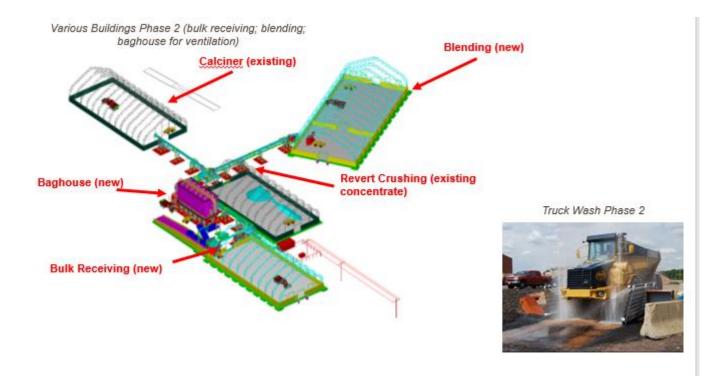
New Revert Crushing Building with Baghouse and truck wash
